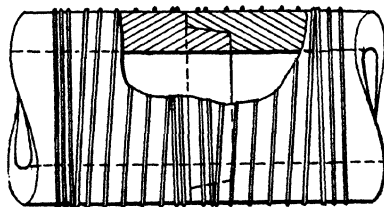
Recessed or Tenon Type Wire-wound Pipe Joint.
